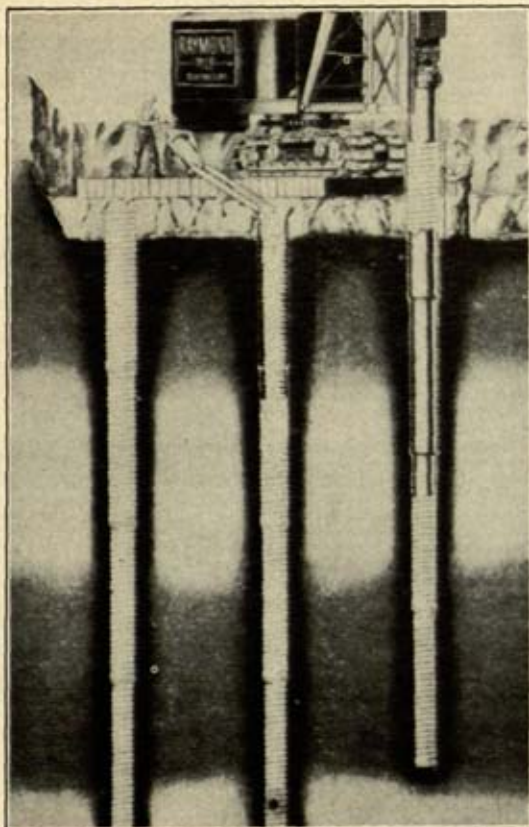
Driving Raymond step-taper piles. (Raymond Concrete Pile Co.)
